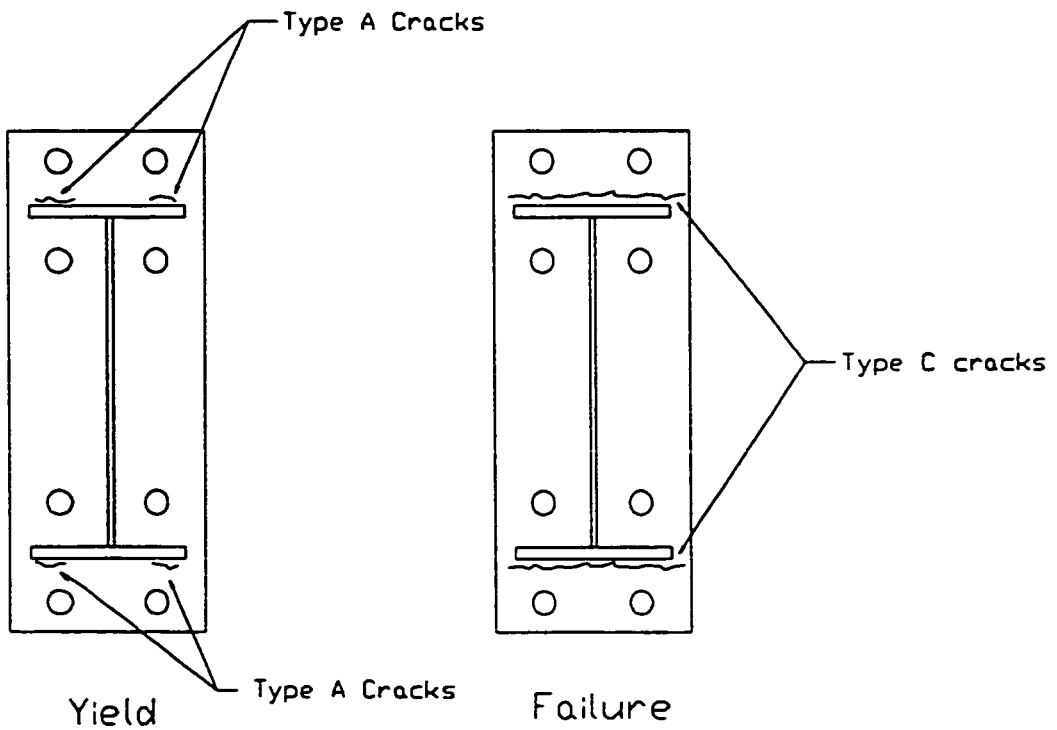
Crack Locations at Yield and Failure for Connection S-2
